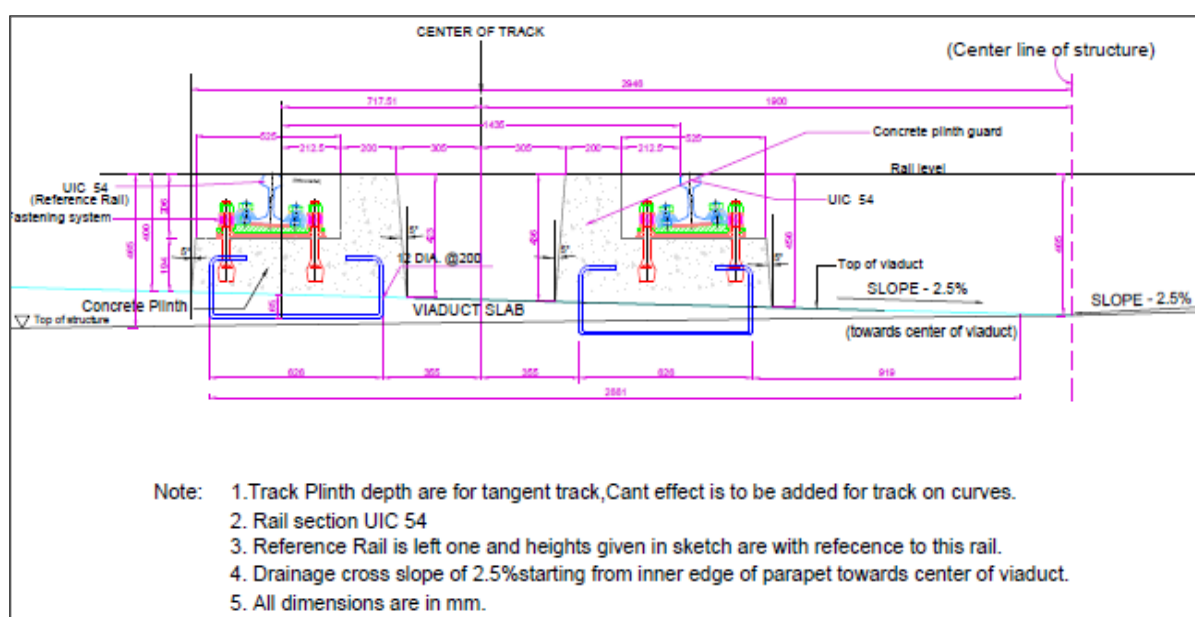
Typical Section of Rail in Ballastless Track (Tangent Section)
